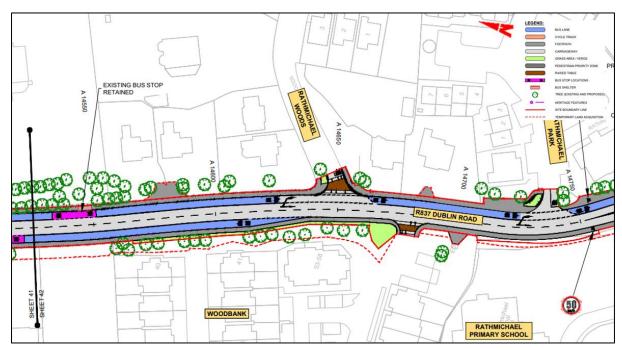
Extract from General Arrangement Drawing at Dublin Road (Sheet 42)
